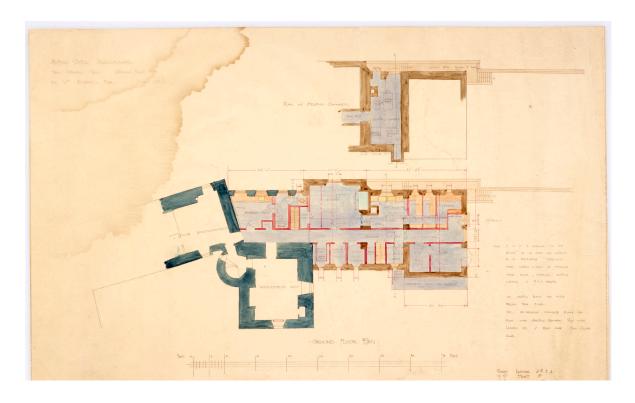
Robert Lorimer, Floor plans and elevations showing alternative schemes for additions and alterations. Ground floor plan of new kitchen wing. Sketch of proposed new entrance doorway, 1916, Hutton Castle © Historic Environment Scotland
